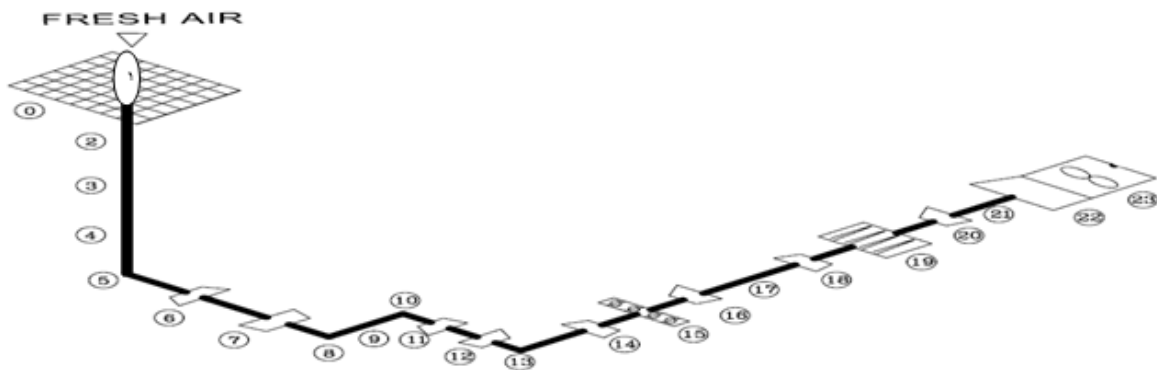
A schematic diagram of Cairo Metro Line 3 tunnel ventilation [32].
